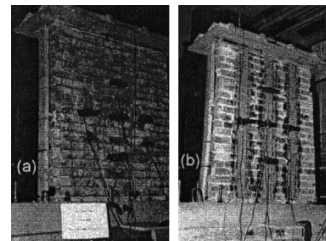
Specimens: (a) As-Built Specimen; (b) Specimen Retrofitted with Tyfo Fiberglass Strips
